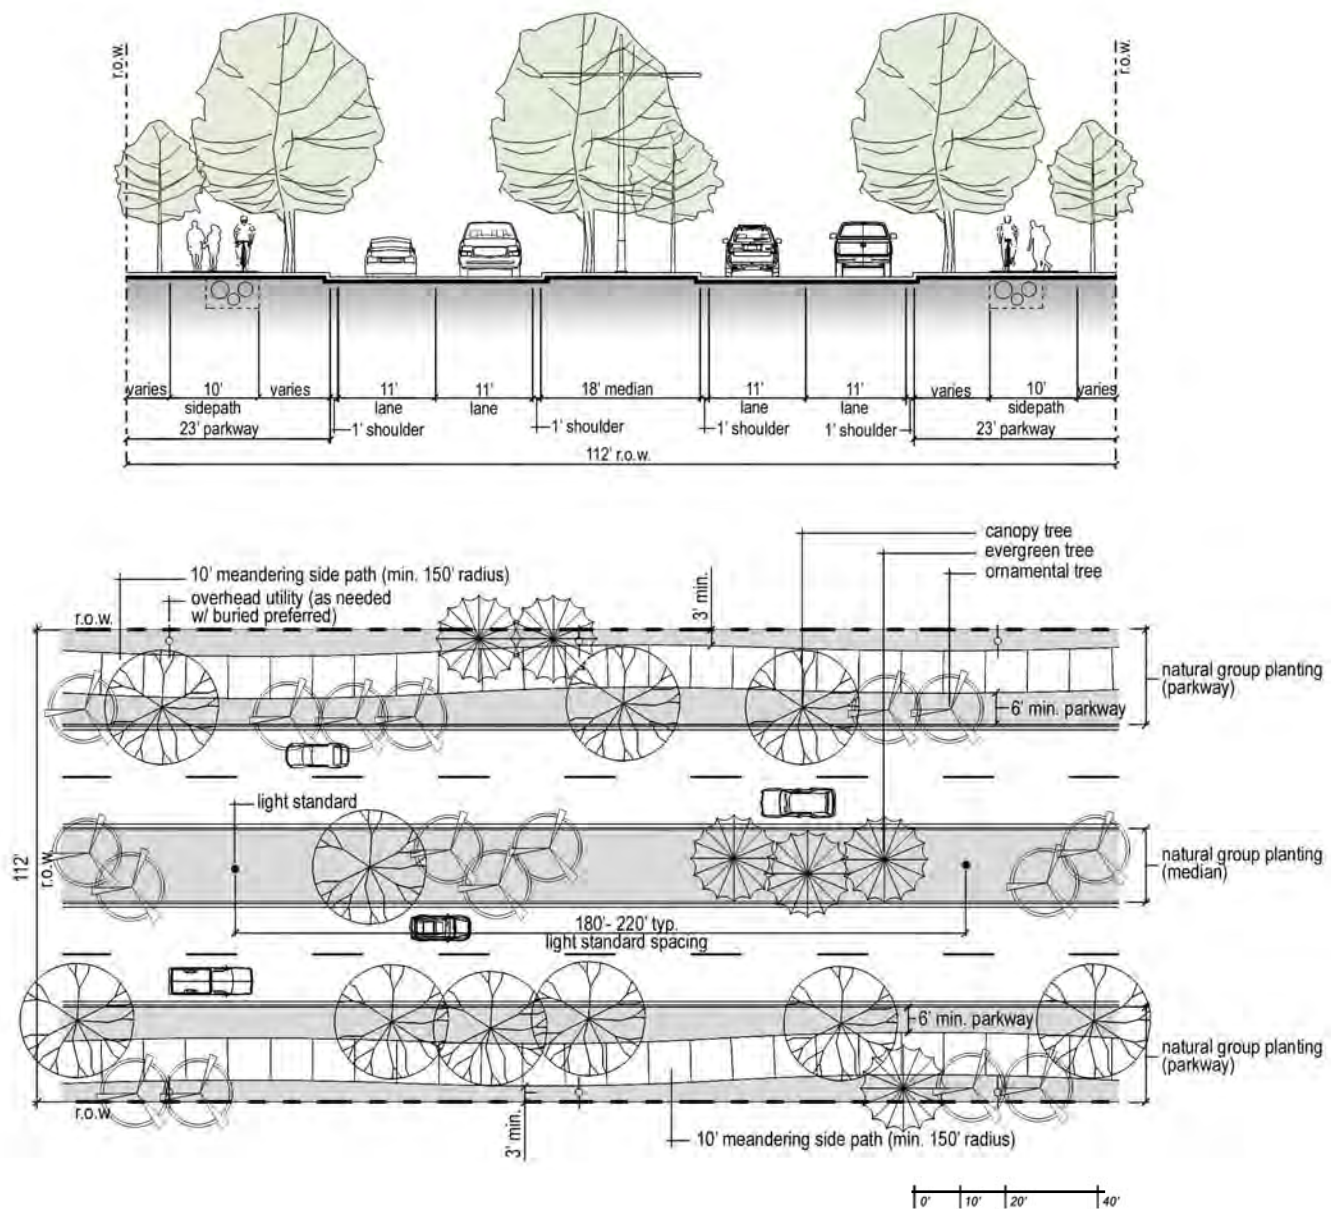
Typical Greenway Arterial Section & Plan: Centered Arterial
